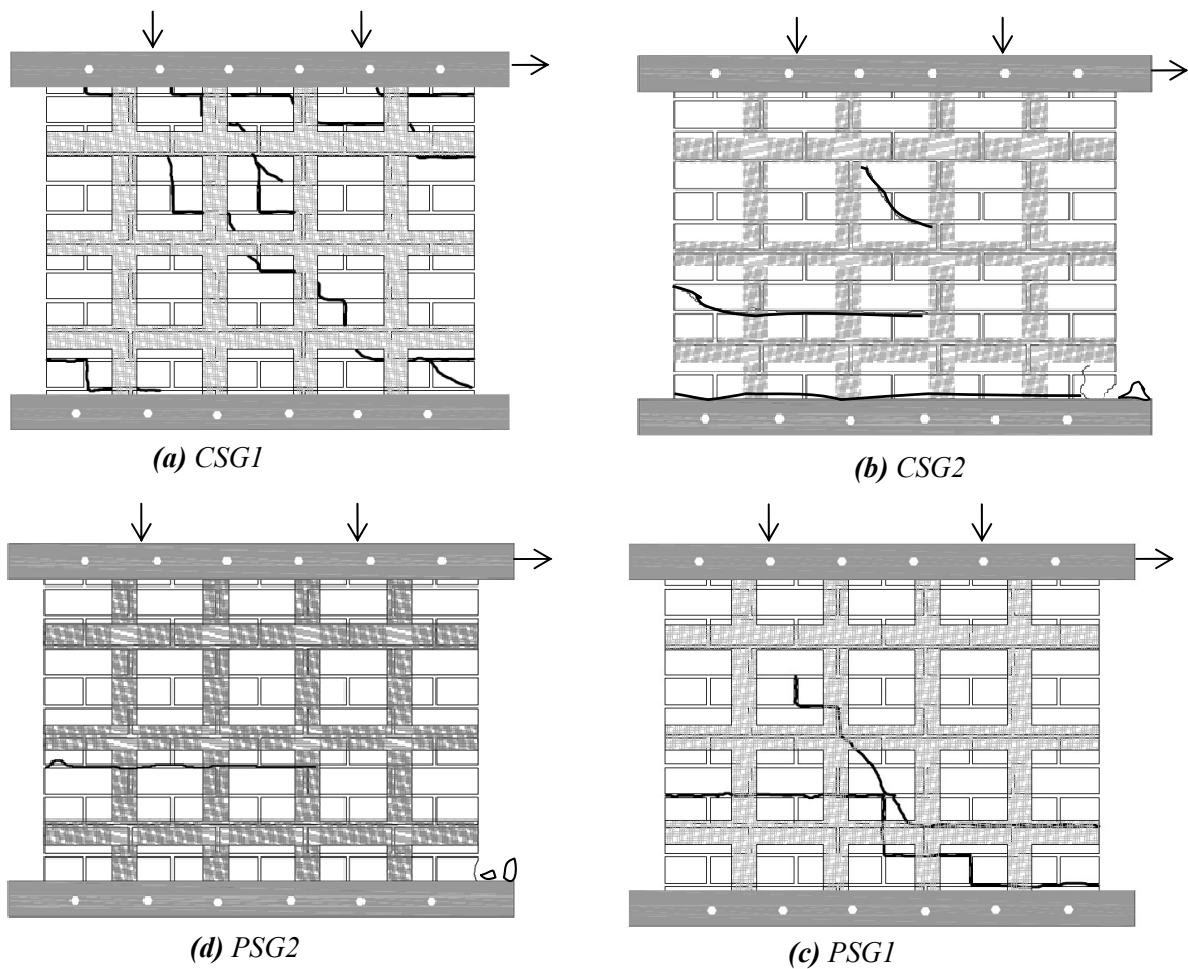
Schematic representation of crack patterns in wall strengthening with FRP grid system
